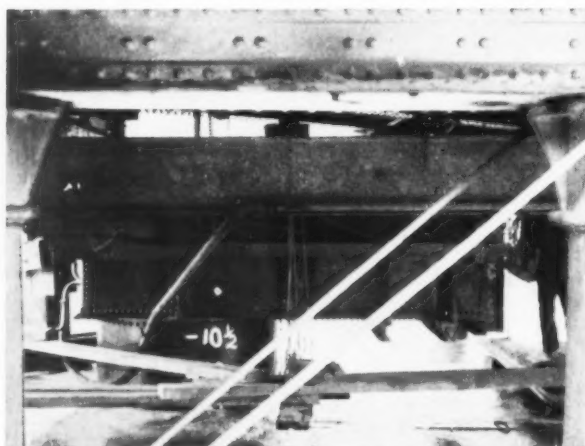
Special air lock with horizontal shaft or gallery under the bridge girders
